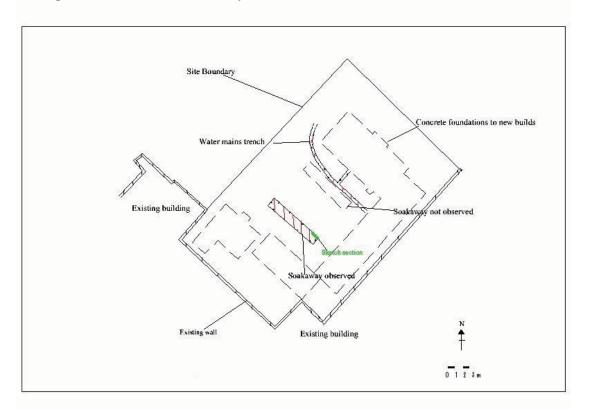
Site plan showing position of soakaways. Drawn using 1:200 plans supplied.
